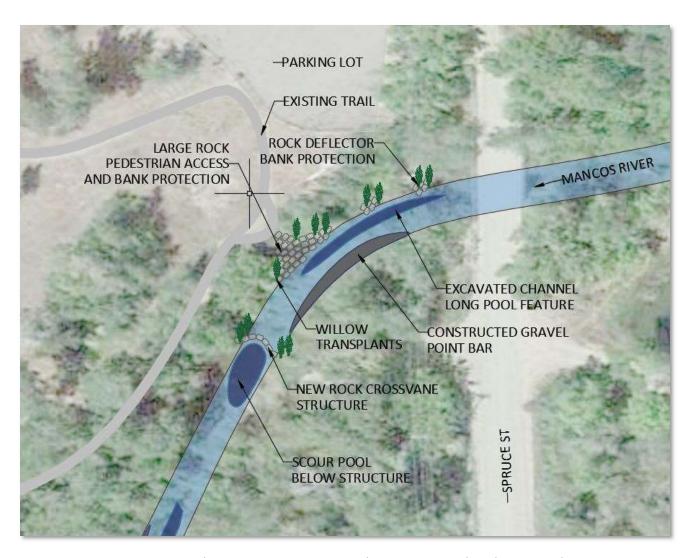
Proposed Improvement Concept Plan Cottonwood Park near Parking Lot.
